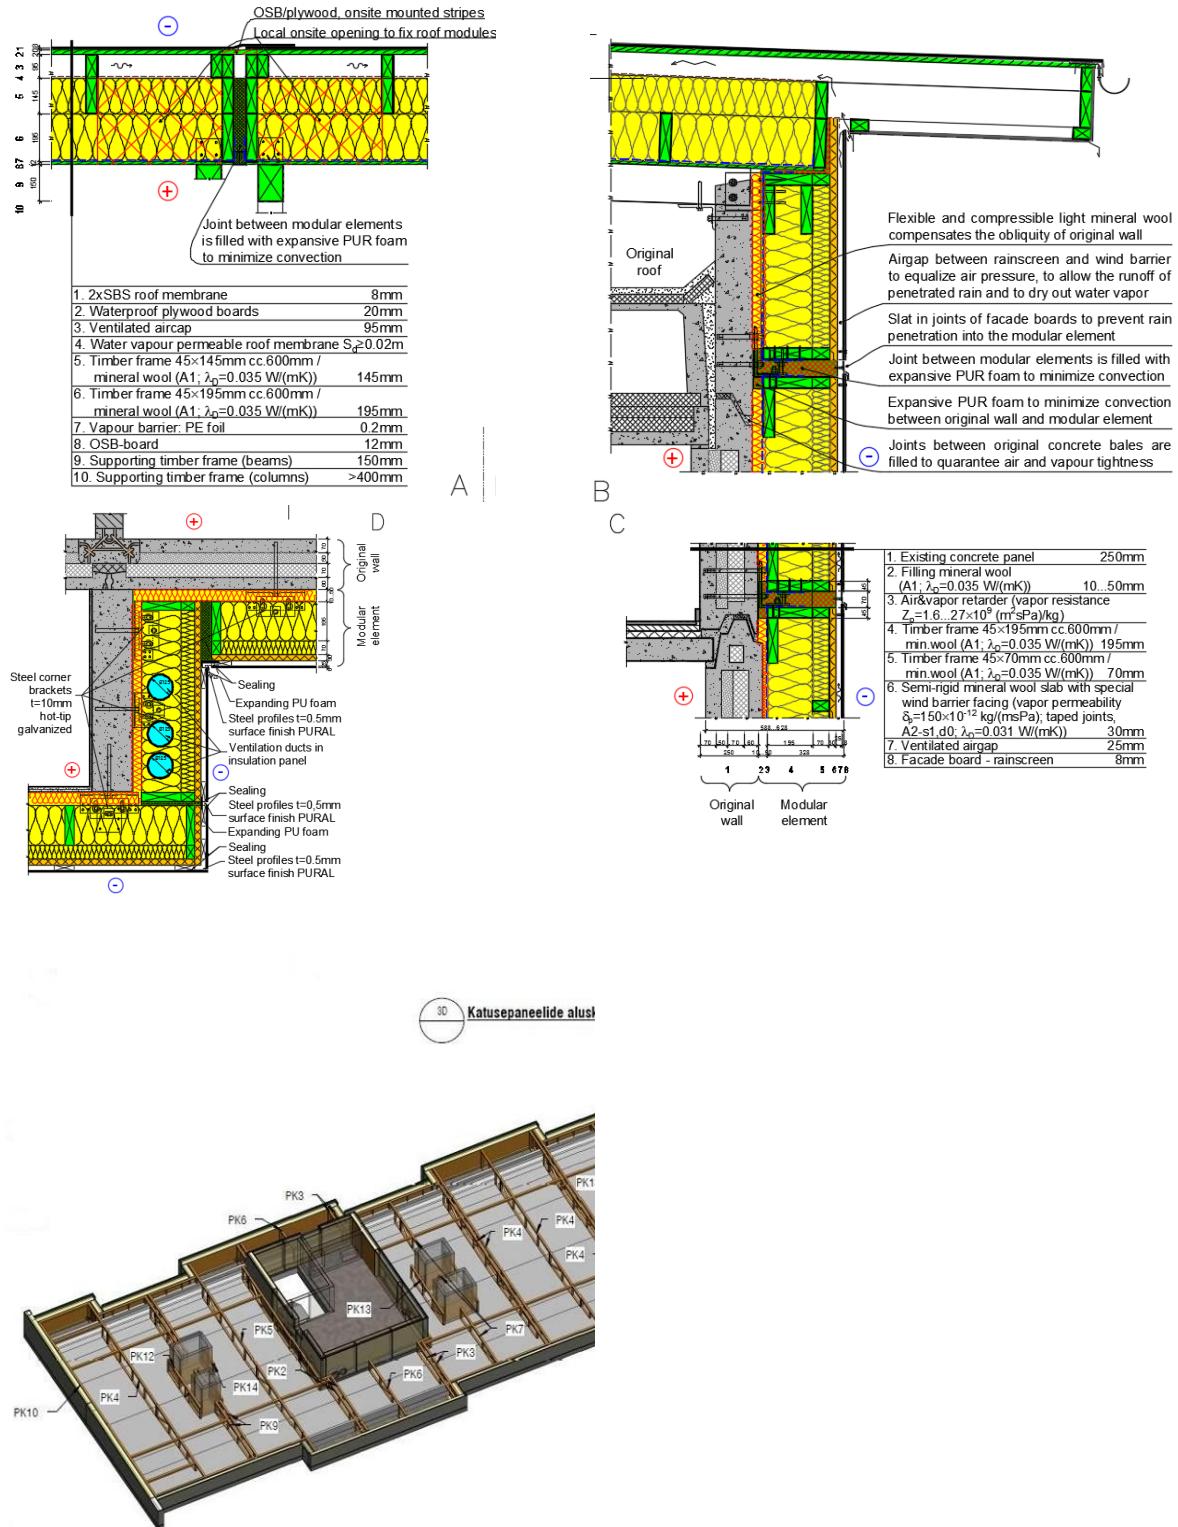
Designed solutions at the different structural points of Estonian pilot building wall modules (above and centre) and roof loadbearing structure (below)
